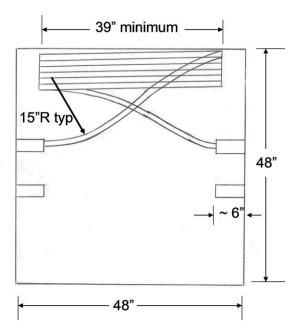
Routing 864f AccuRiser cable in a 48" x 48" manhole (top view).
